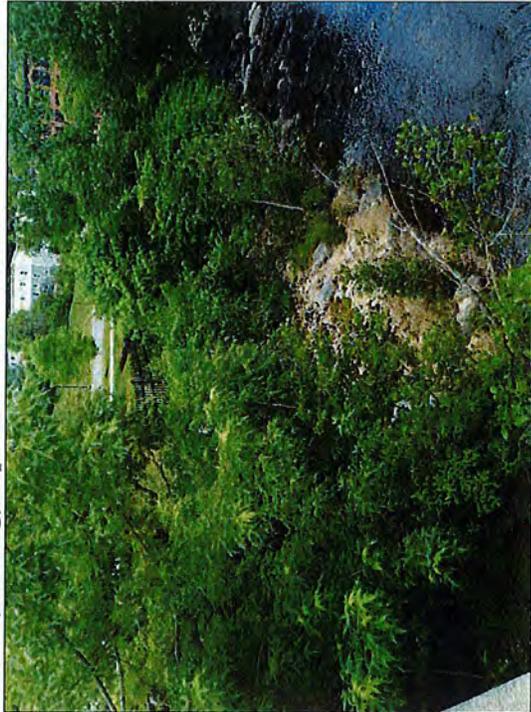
Sheldon Street: Heavy vegetation and shoaling downstream left bank.
